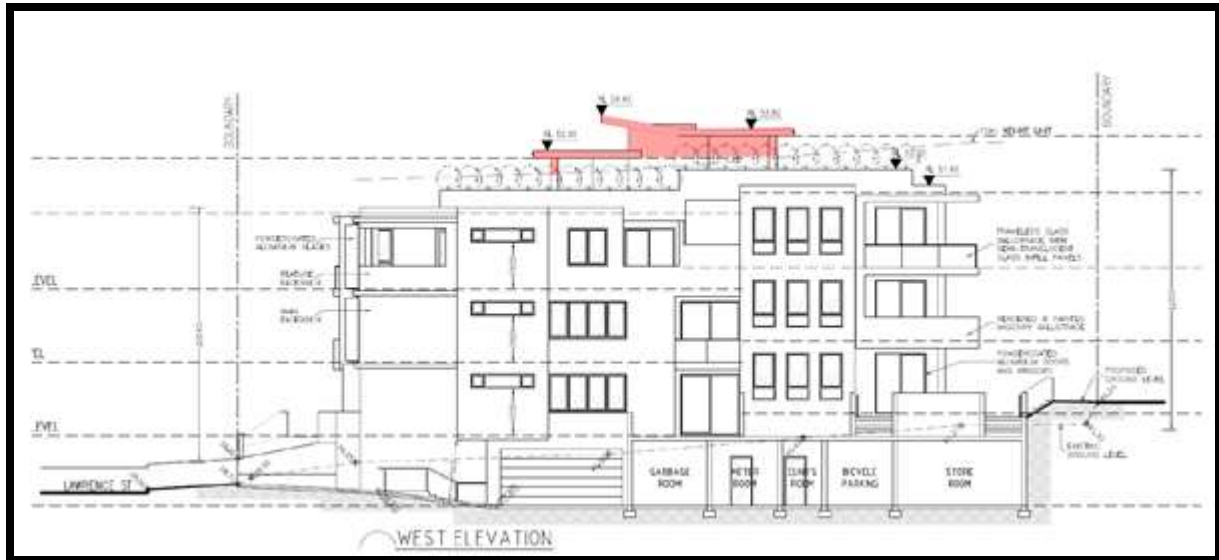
'Figure 14' from the submitted Statement of Environmental Effects (SEE) Western Elevation (Source: Planning Ingenuity, 2018)
